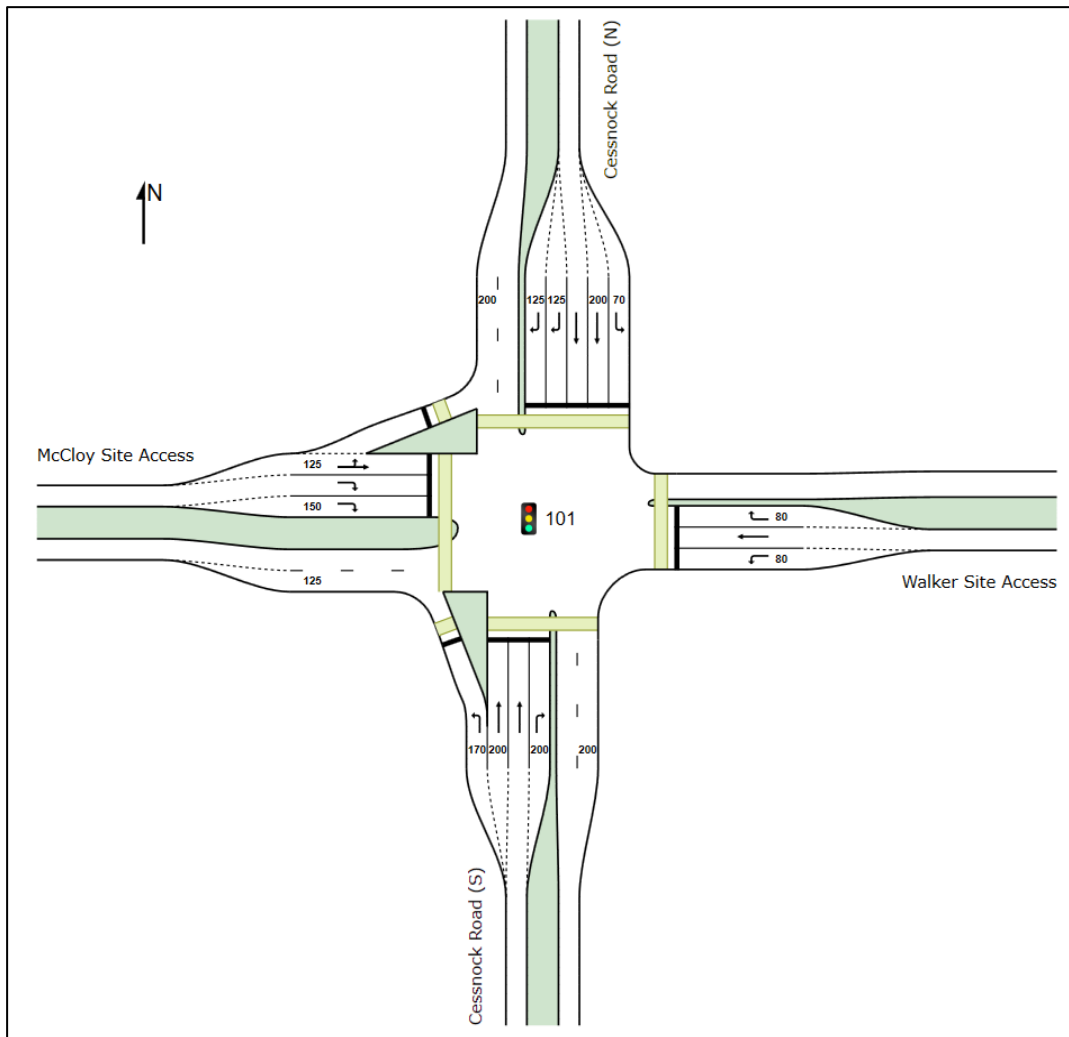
Proposed ultimate layout for new 4-way intersection at Cessnock Road / Walker / McCloy development site
